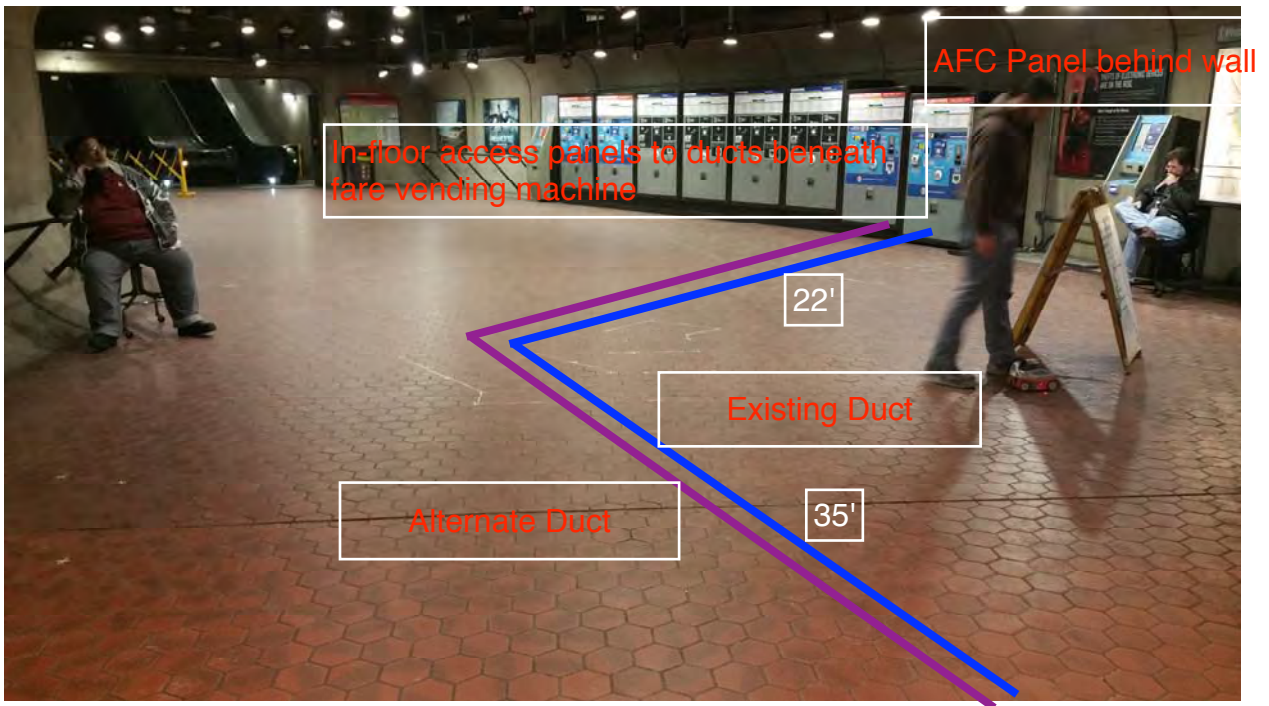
In floor access panels for existing and alternate ducts (beneath fare vending machine)
